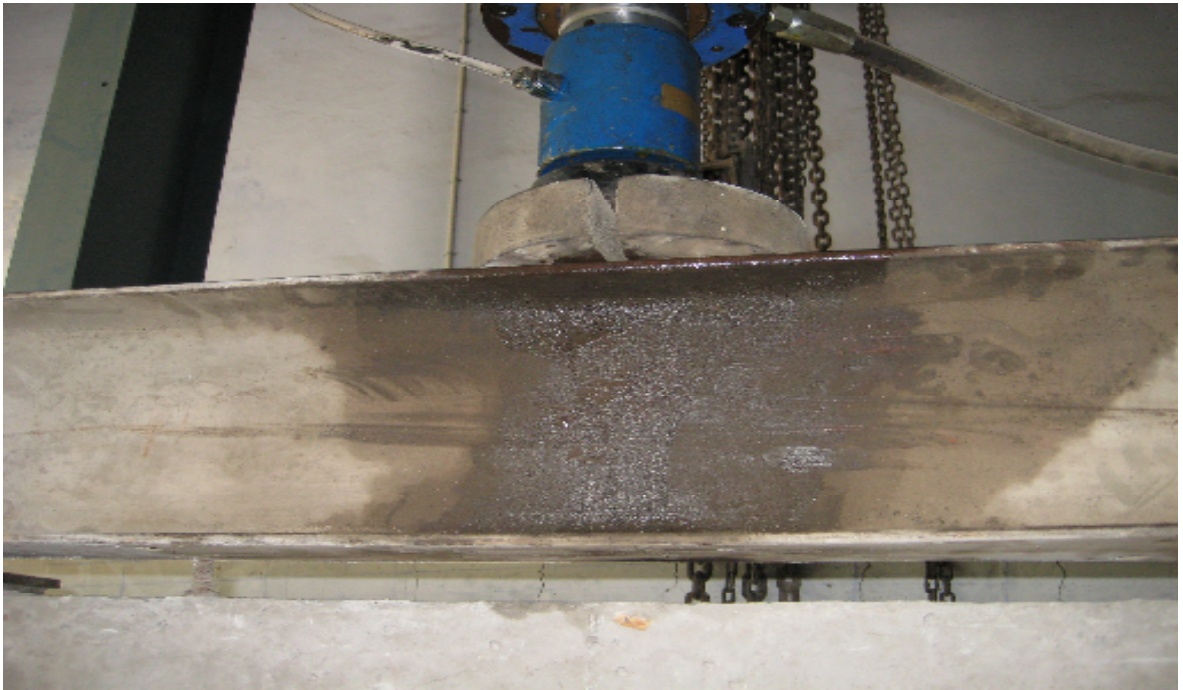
TESTING JACK WITH SYSTEM FOR CONVERTING CONC. LOAD TO TWO POINT LOAD
